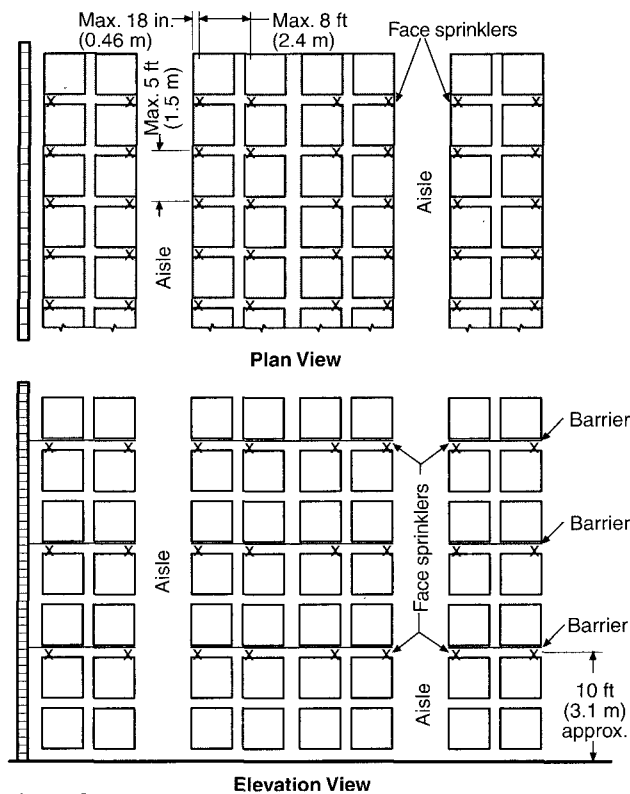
(c)* In-rack sprinkler arrangement, multiple-row racks, cartoned plastic and exposed unexpanded plastic, storage height over 25 ft (7.6 m).
